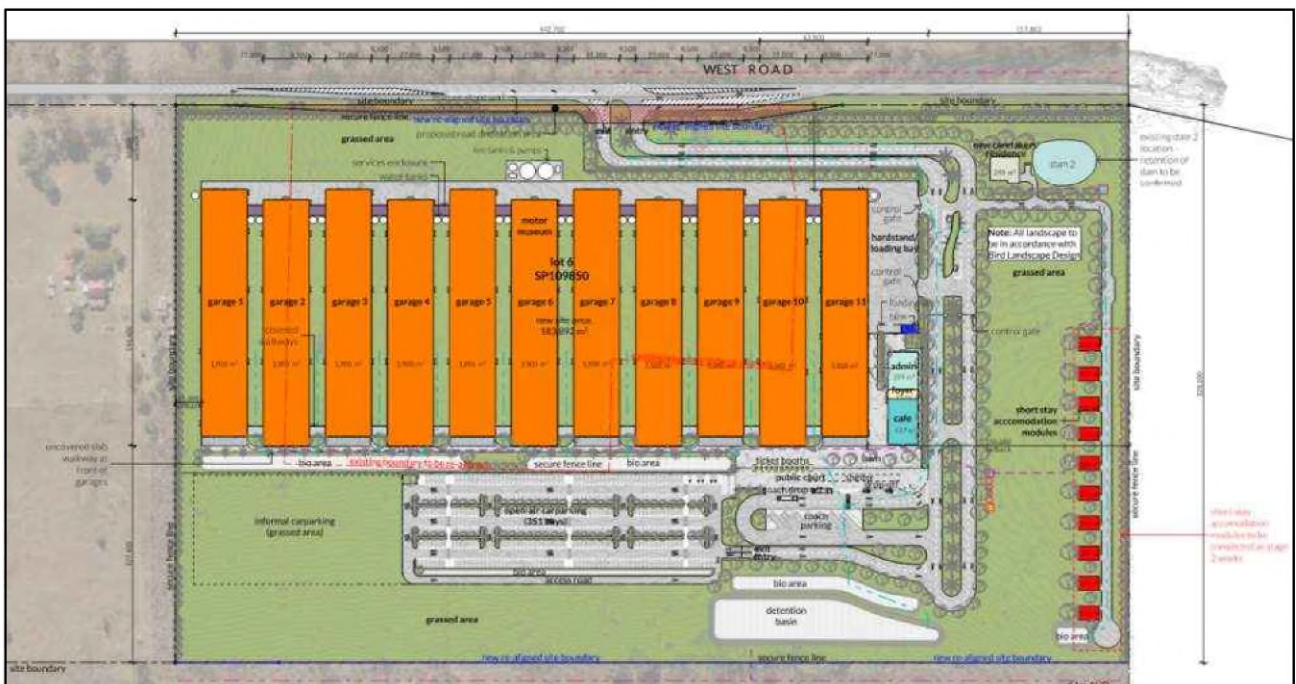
Development Site Plan (Courtesy: Billy Dawson Architects)
